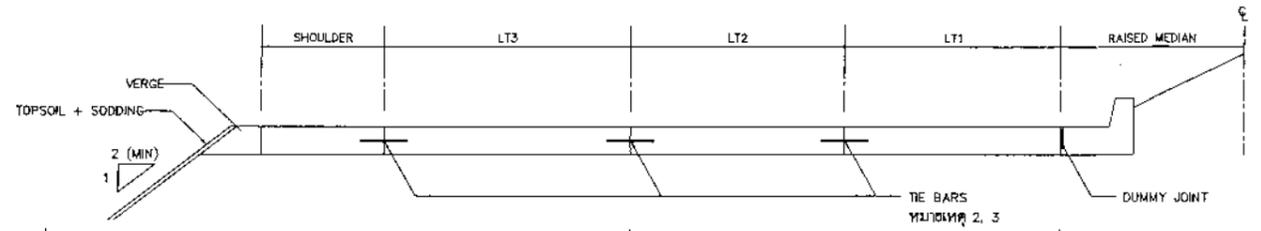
DETAIL OF LONGITUDINAL JOINT FOR HIGHWAY INTERSECTIONS
